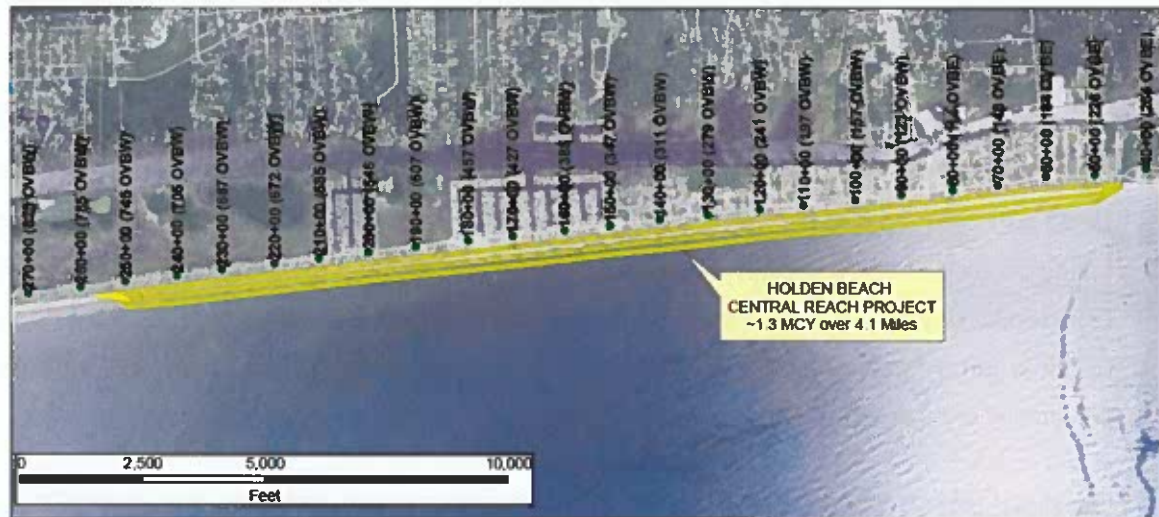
Central Reach Beach Fill Placement Footprint (Construction from 1/3/17 to 3/17/17 from Approximately Station 45+00 to Station 257+00)
